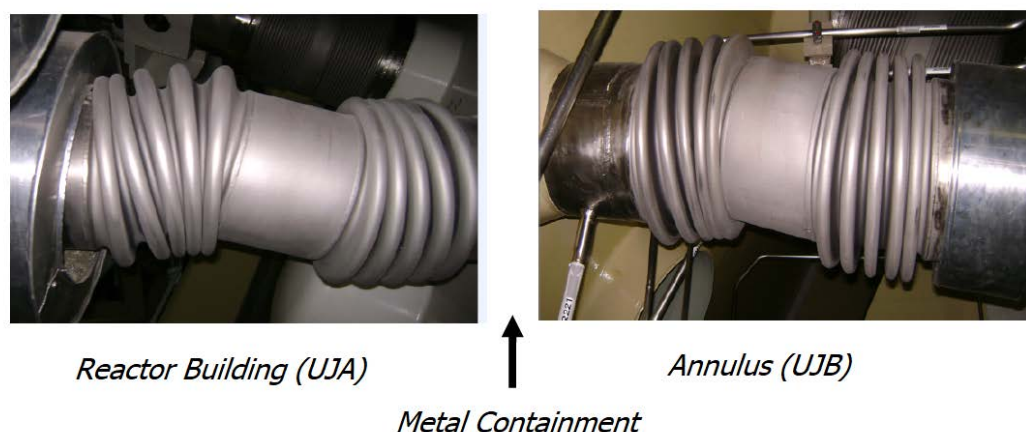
Distorted penetration expansion joints (LCQ50) of the steam generator purge system
